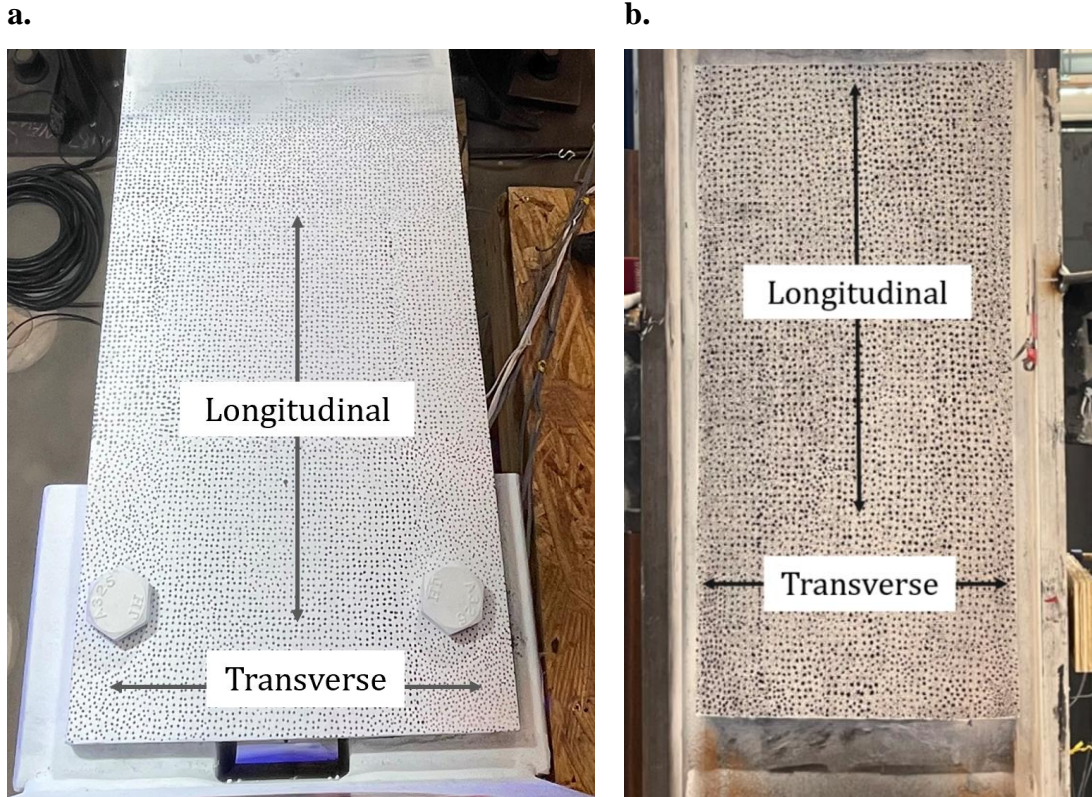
Longitudinal and Transverse Directions (a) Flange and (b) Column Web
